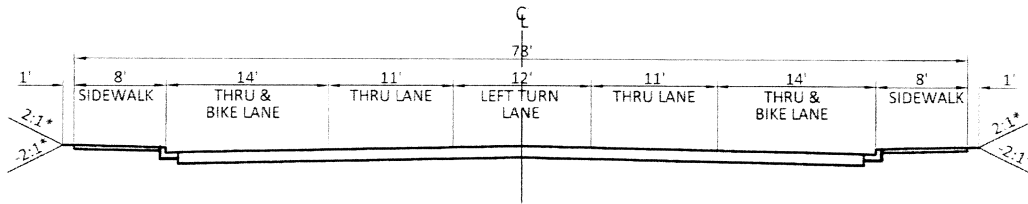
h STREET SE – SEGMENT 2
